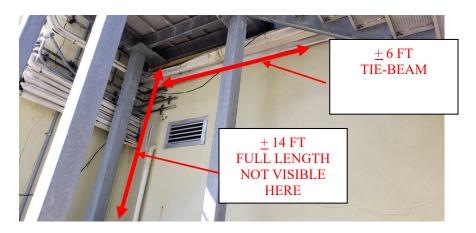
Location 20: Approximately 14 ft long new 16x8 concrete column. See detail /S104. Approximately 6 ft long new 8x16 horizontal tie-beam. See detail 5/S104.
